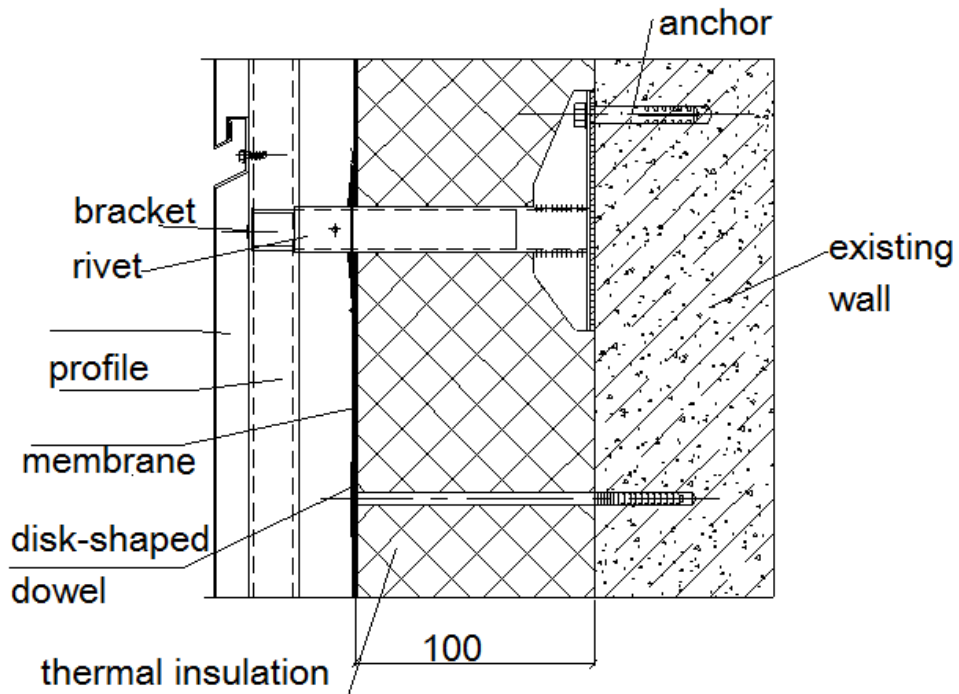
Design of an External Wall of a II-18/12 Residential Building after Façade Renovation.
